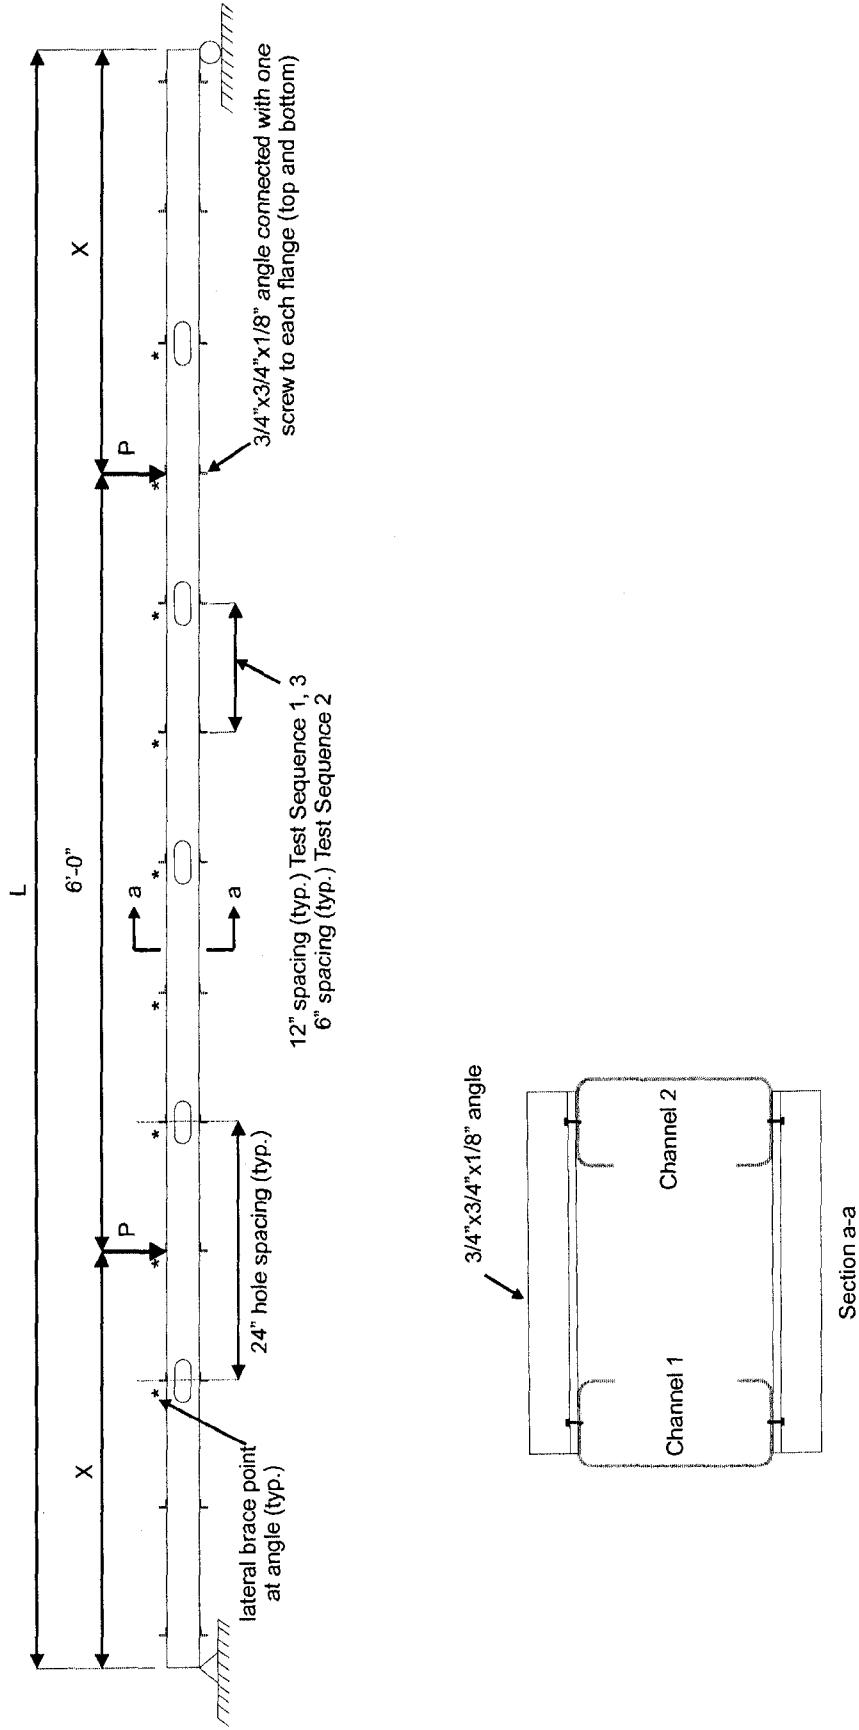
Experiment test setup with hole spacing, location of lateral bracing, spacing of aluminum angle straps, and load points
